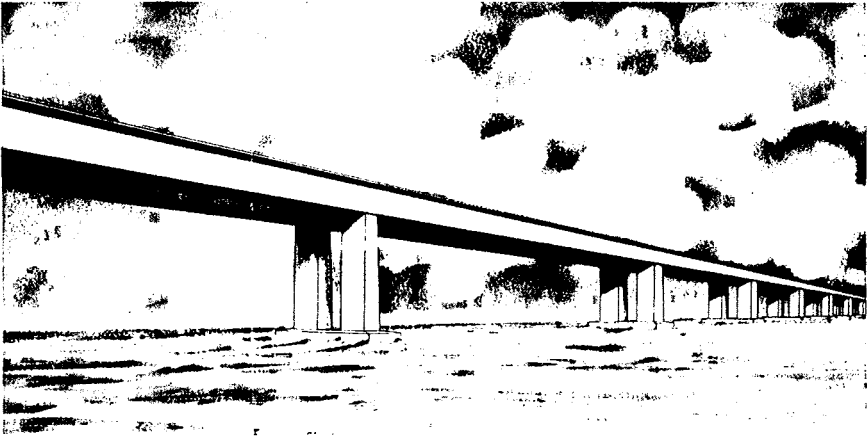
Bridge Design for the Danish Great Belt - West Channel Crossing
